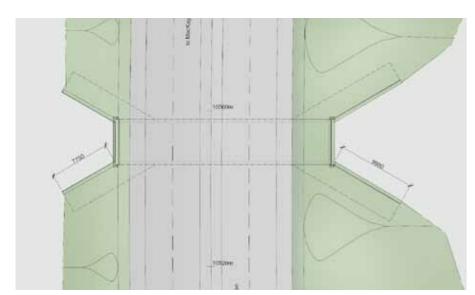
Bridge 7: Battle Hill Farm Forest Park (BHFFP) underpass plan
